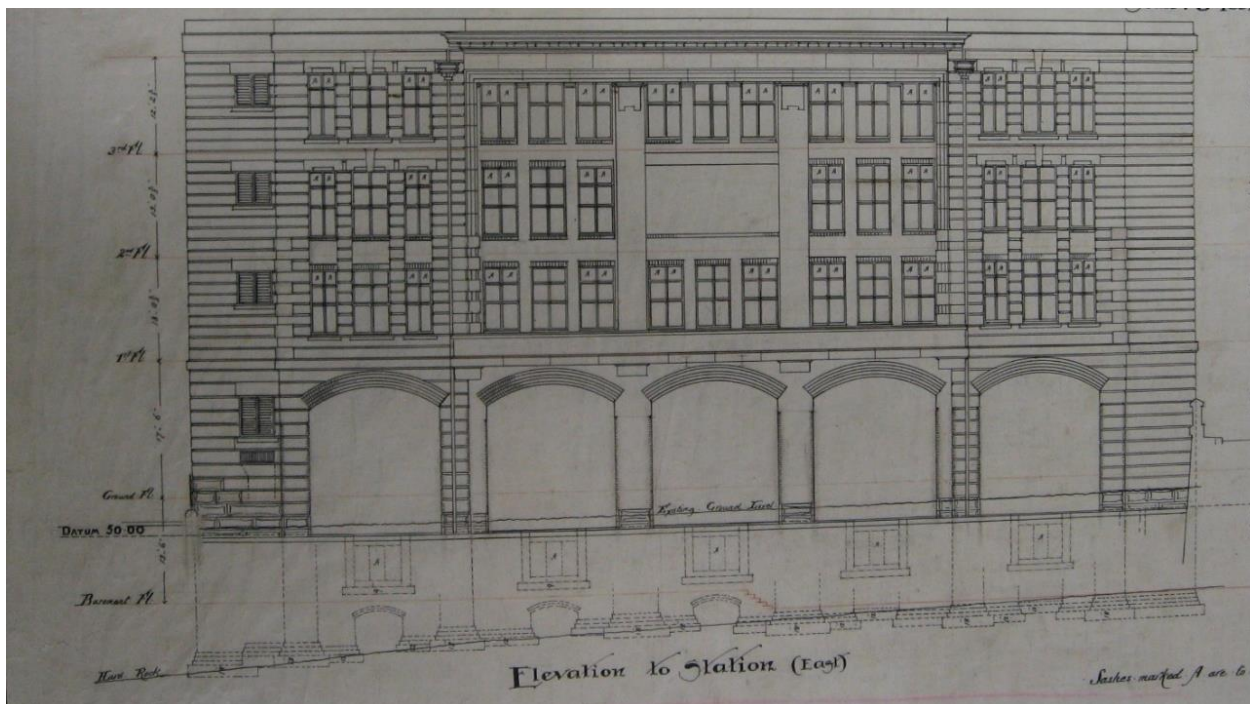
New Parcels Post Office Premises at the Central Railway Station Sydney: Elevation to Station (east), 1910.
